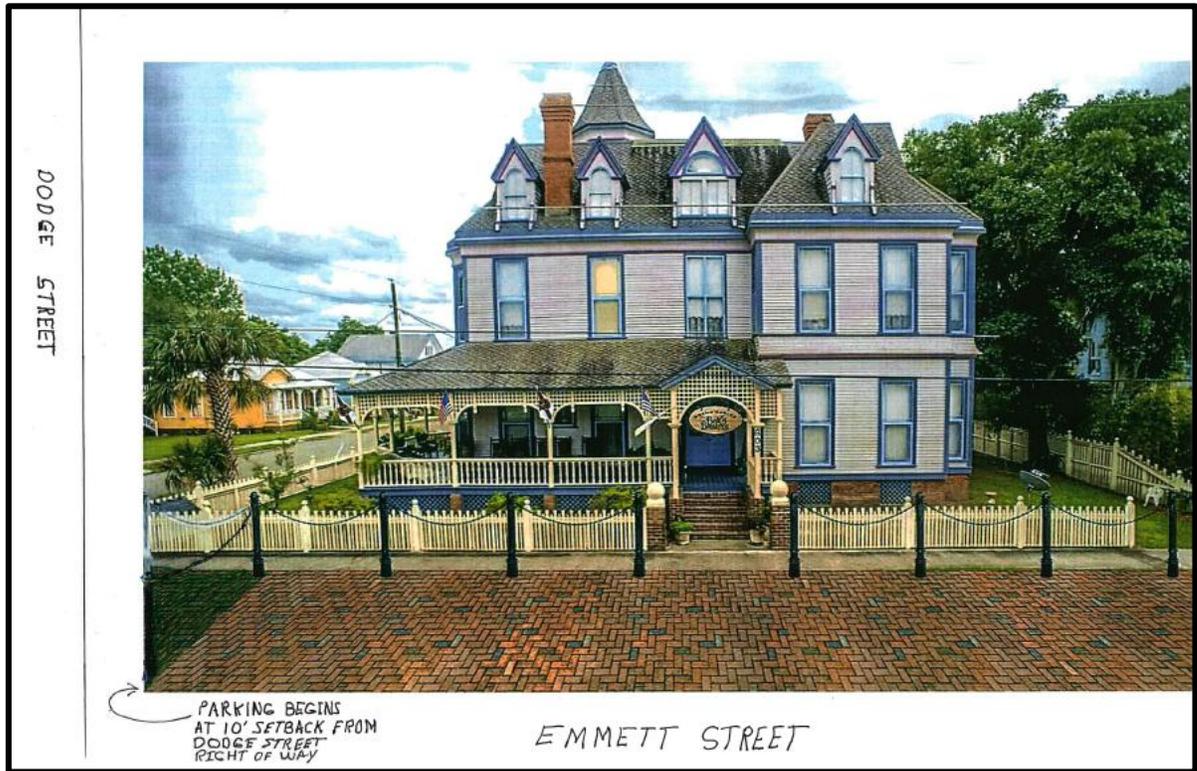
Applicant's schematic of signage, fencing, and right-of-way parking (from Emmett St.)
